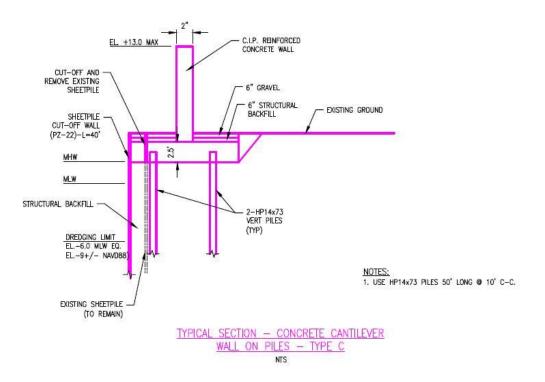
Typical Section – Concrete Cantilever Wall – Type C
